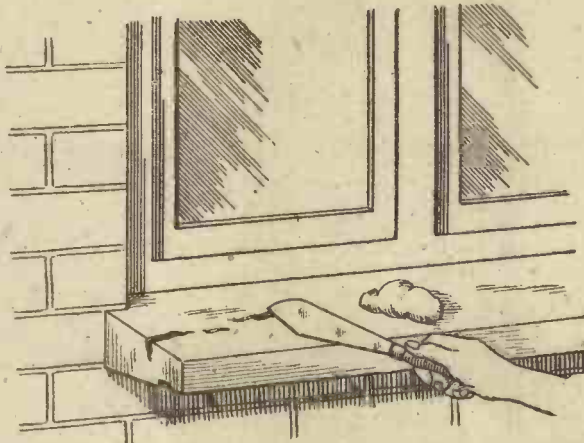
Cracks in wooden window sills and window frames can be filled in with putty.
